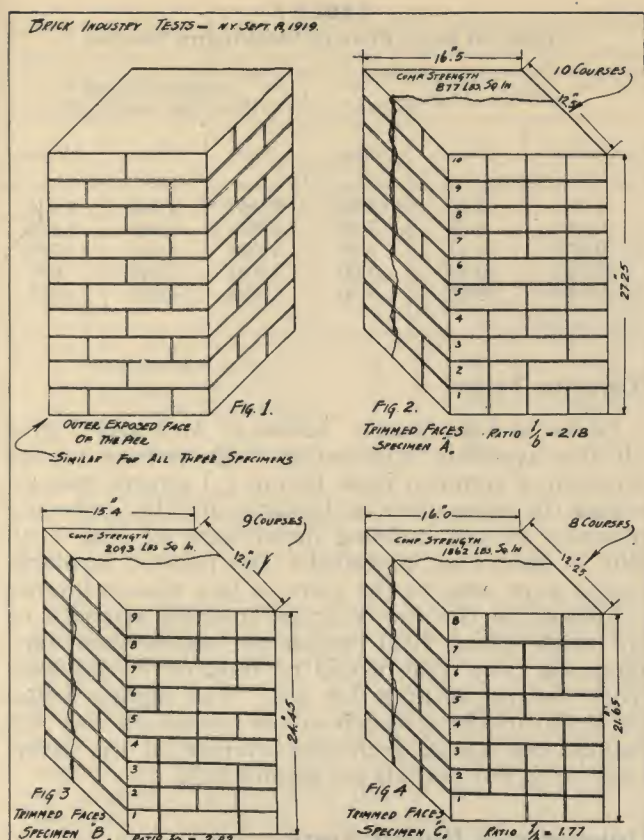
Fig. B. Diagram Indicating Bond of Test Specimens, also General Location of Cracks First Appearing
